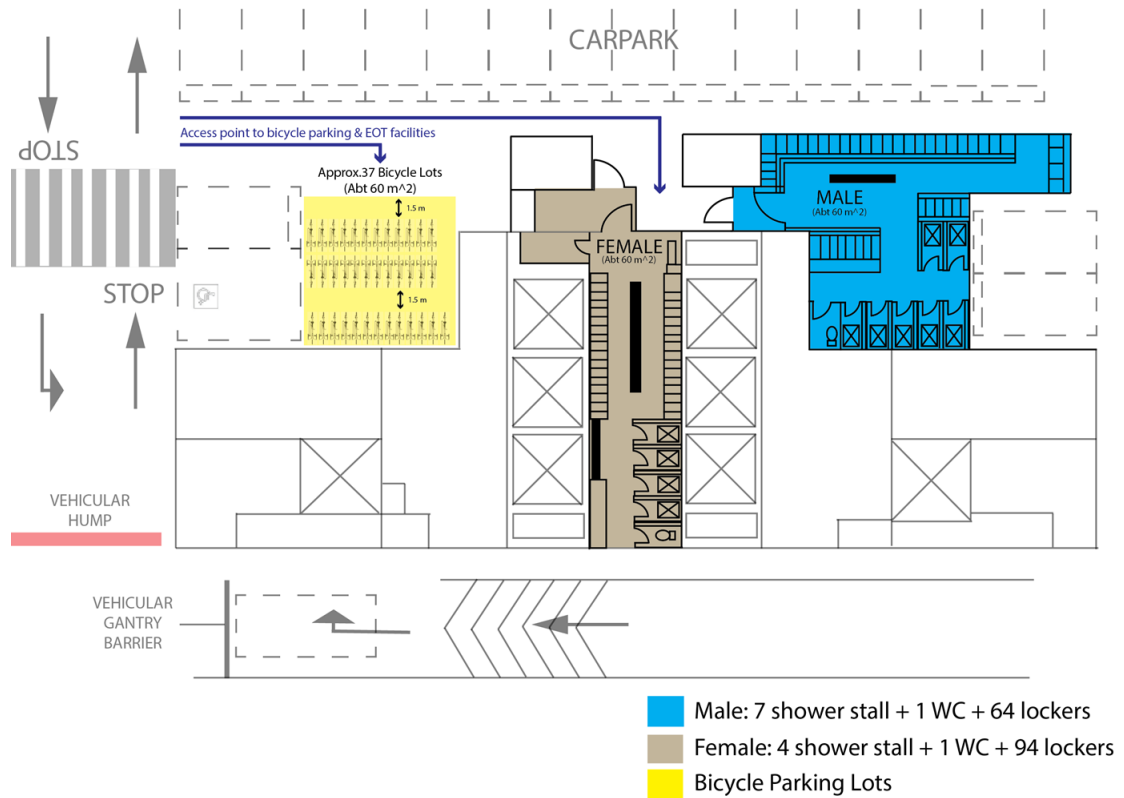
Example of a Bicycle Parking and End-of-Trip Facility Plan
